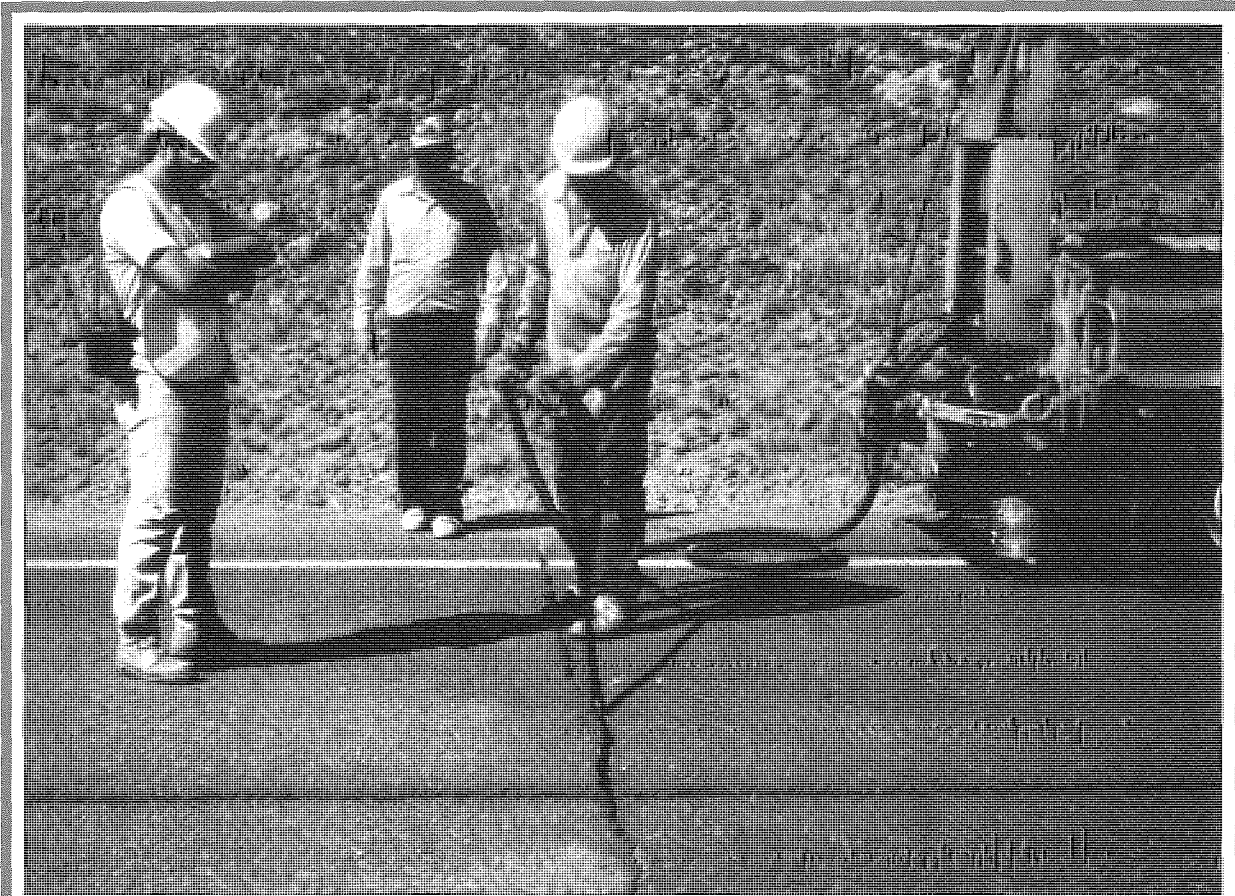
Filling a Crack With Asphalt Emulsion
